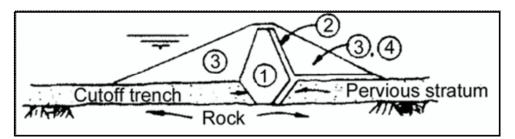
Example of a zoned embankment dam section (2012). Legend: Zone 1, impervious core; Zone 2, filter drain material (may require a two-stage filter); Zones 3 and 4, engineered and (if suitable) bulk fill.
